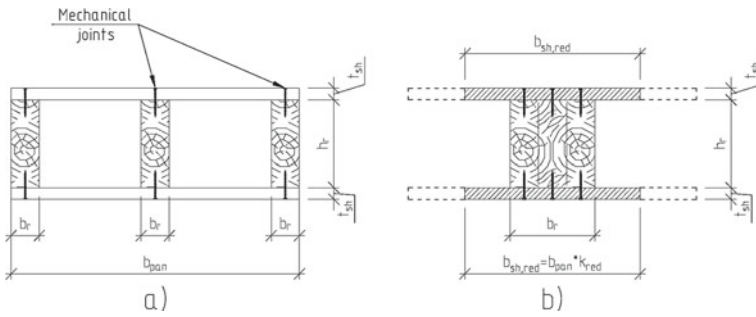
Schematic of the calculated reduced panel cross-section: a—actual cross-section; b—design cross-section
